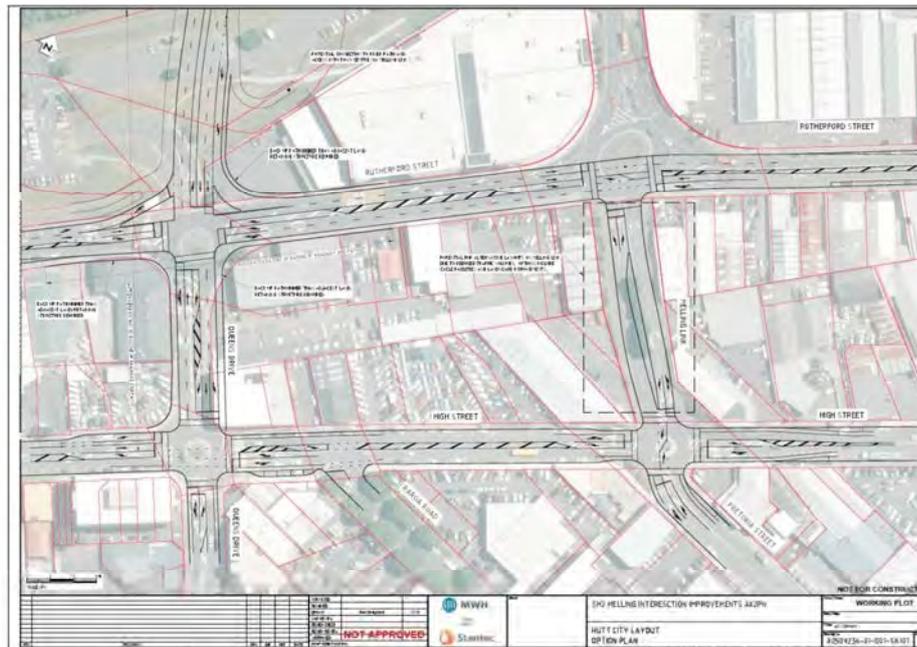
Proposed Hutt City Intersection Layouts (2018)
